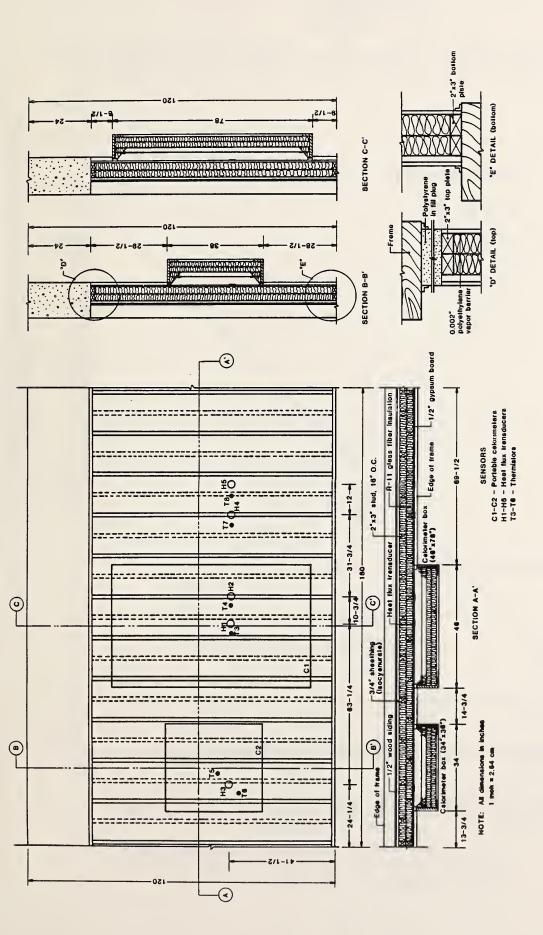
Construction Details and Sensor Locations on the Well Insulated Double-Stud Test Wall
